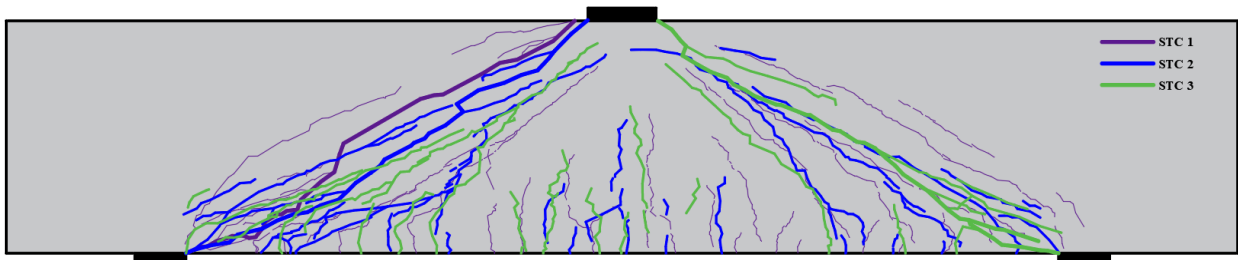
Overlapping crack patterns of beams STC1, STC2, and STC3.
